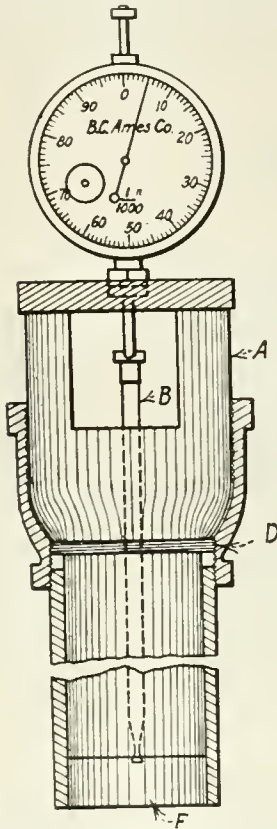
READING SECTIONS OF SUBGRADE TESTING CYLINDERS.
